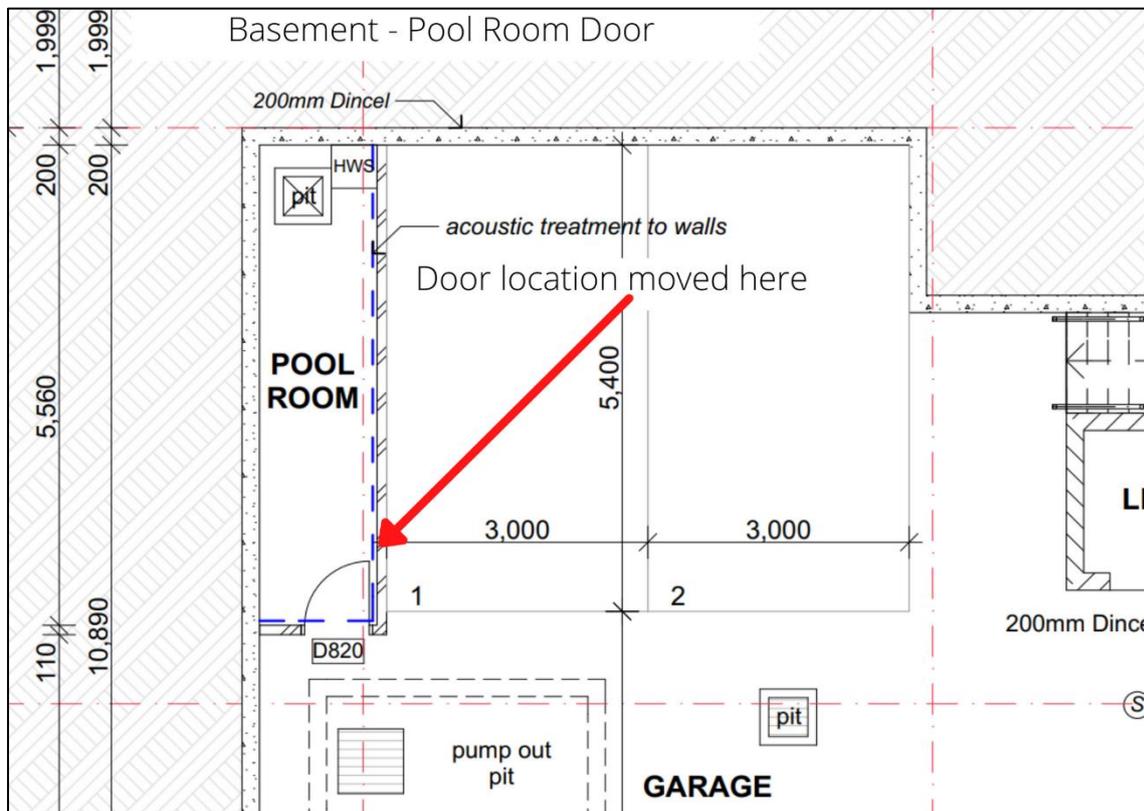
Council's Compliance Officer's mark-up of the basement plan demonstrating the moved door from the southern wall to the eastern wall that opens to the parking spaces.
